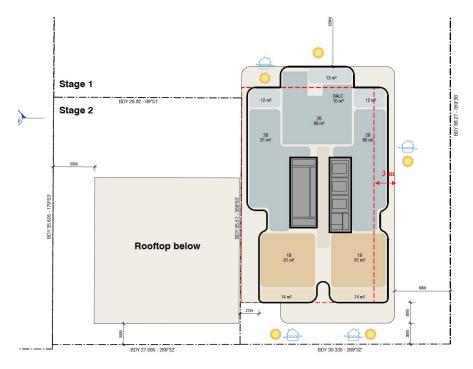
Typical Plan showing 3 north facing apartments where only 2 are possible within the 3m setback - Source: PDM
